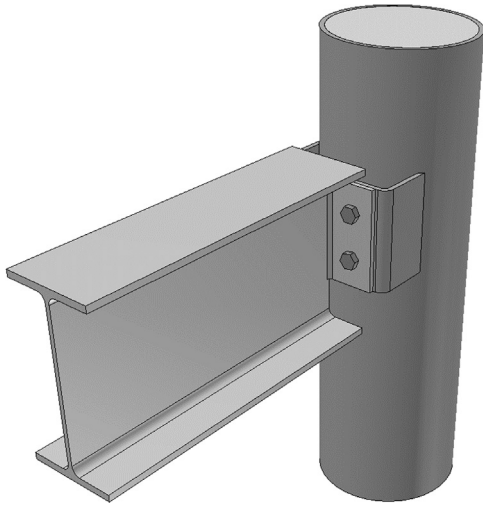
Schematic of a reverse channel connection of a beam to a concrete-filled tubular column.
